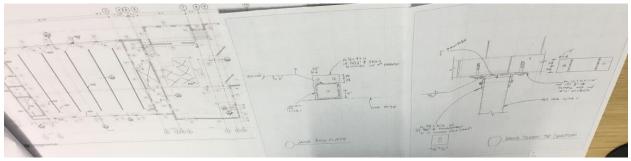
Structural engineer's hand drawn details of the top and base connections of the garage door jamb on the right with printed structural drawings of the buildings being used for reference on the left.
